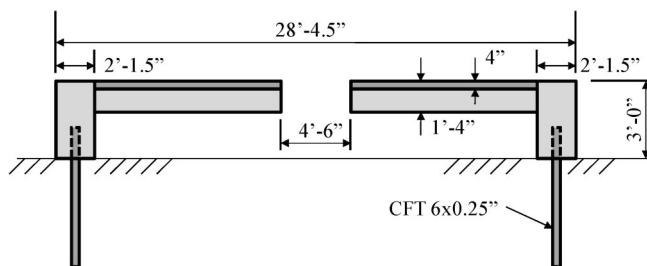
Elevation View of Quarter-Scale Integral Abutment Experimental Model
